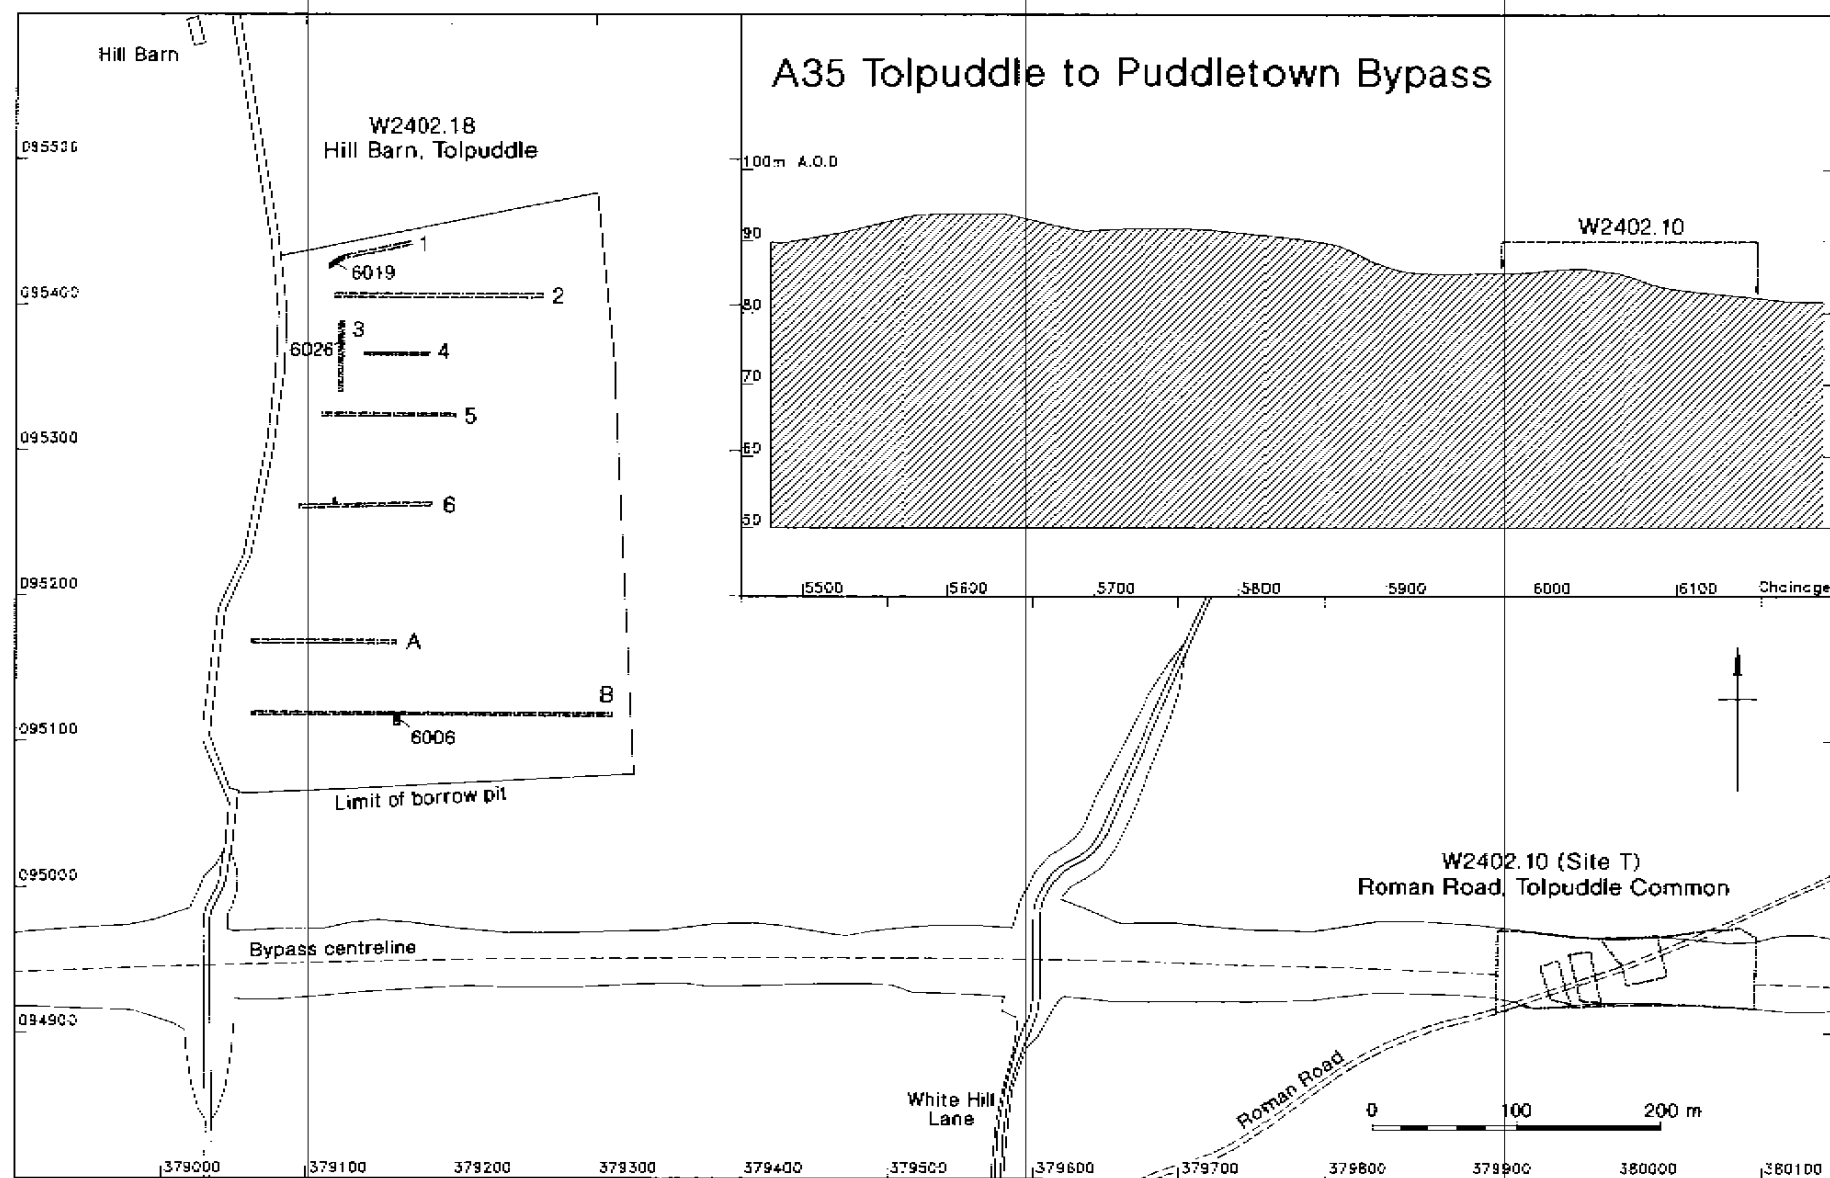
Route detail: Hill Barn Borrow Pit to Roman Road crossing
